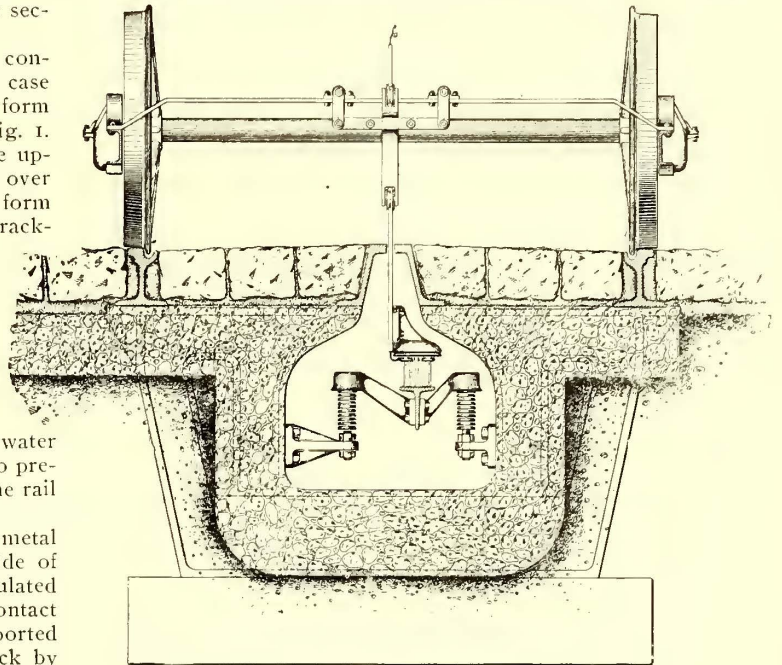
CROSS SECTION THROUGH CONDUIT
